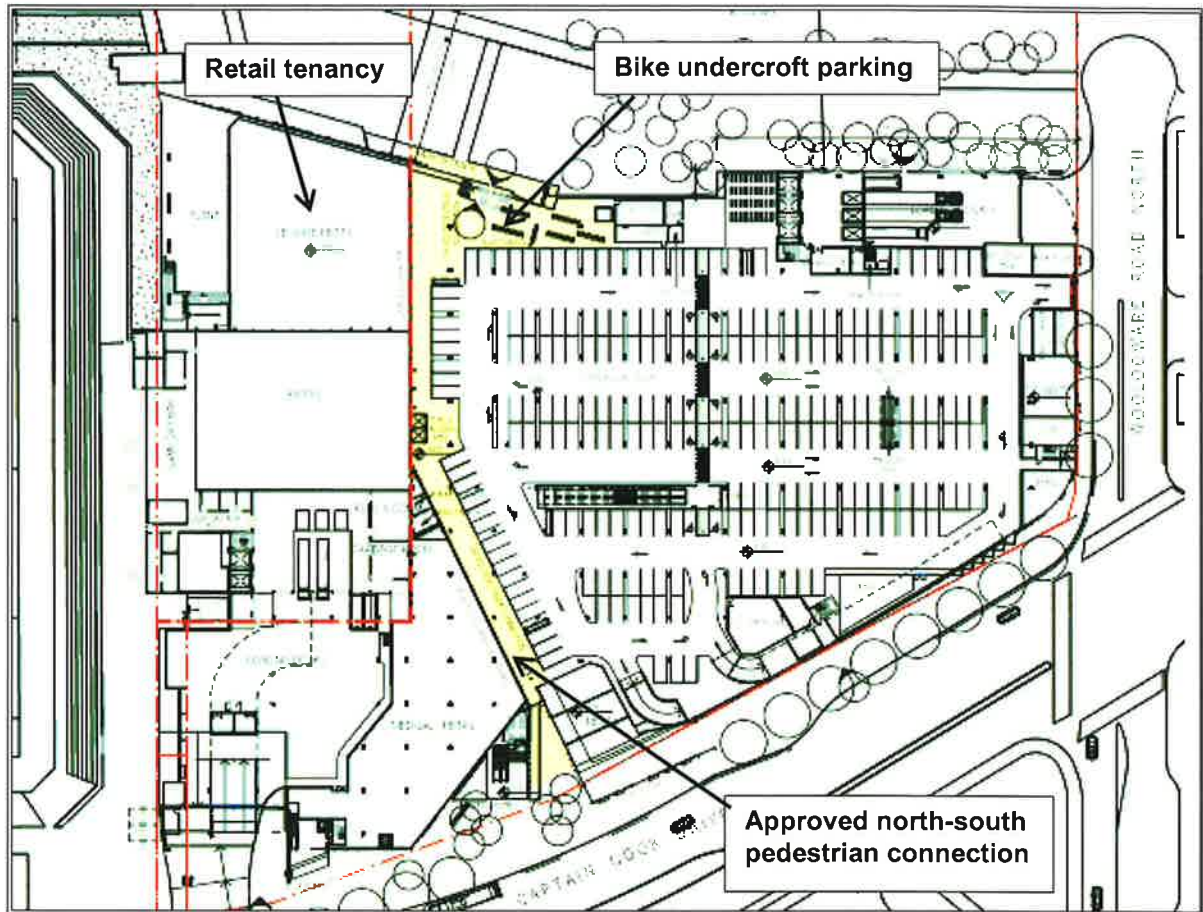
Level 1 (Approved) (Source: Proponent's modification application, 2016).
